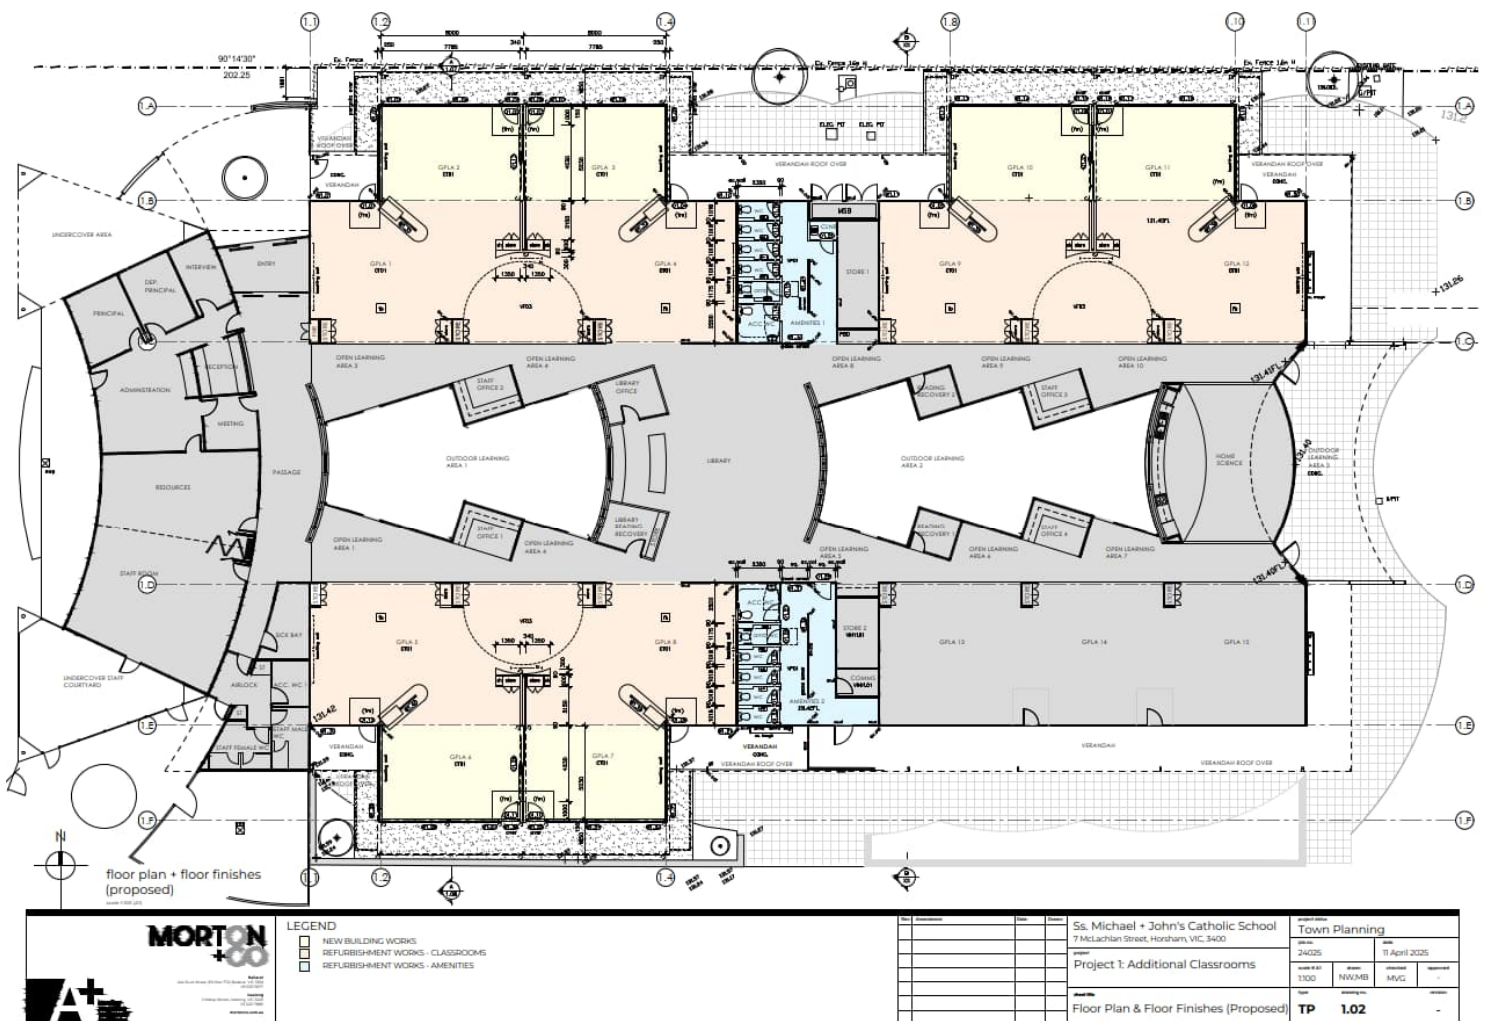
Classroom Floor Plan (Source: Morton & Co Architects)
